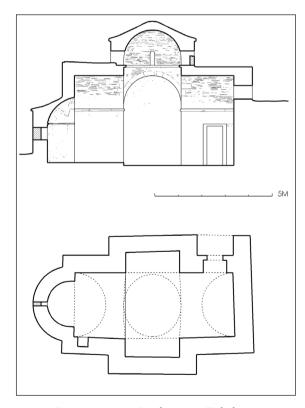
Agios Stephanos in Tsikalario. Plan and longitudinal section.
